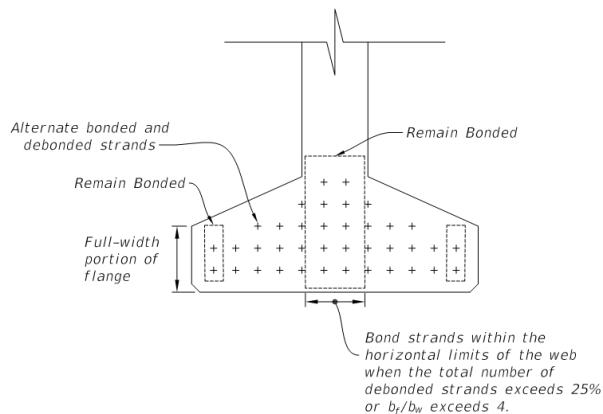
Details for Single-Web Flanged Sections
